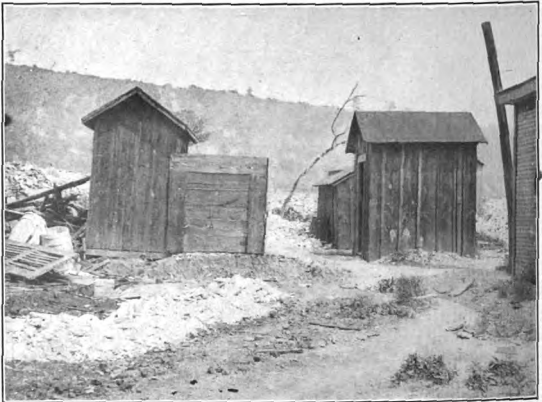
COMMON OUTDOOR TOILET. NOTE CONSTRUCTION AND UNTIDY SURROUNDINGS.
